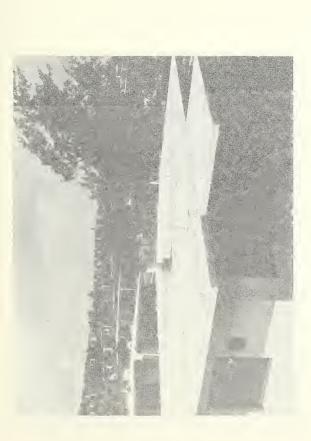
BUILT-UP ROOFING ON TYPE C HOUSING, SUKIRAN AREA.
